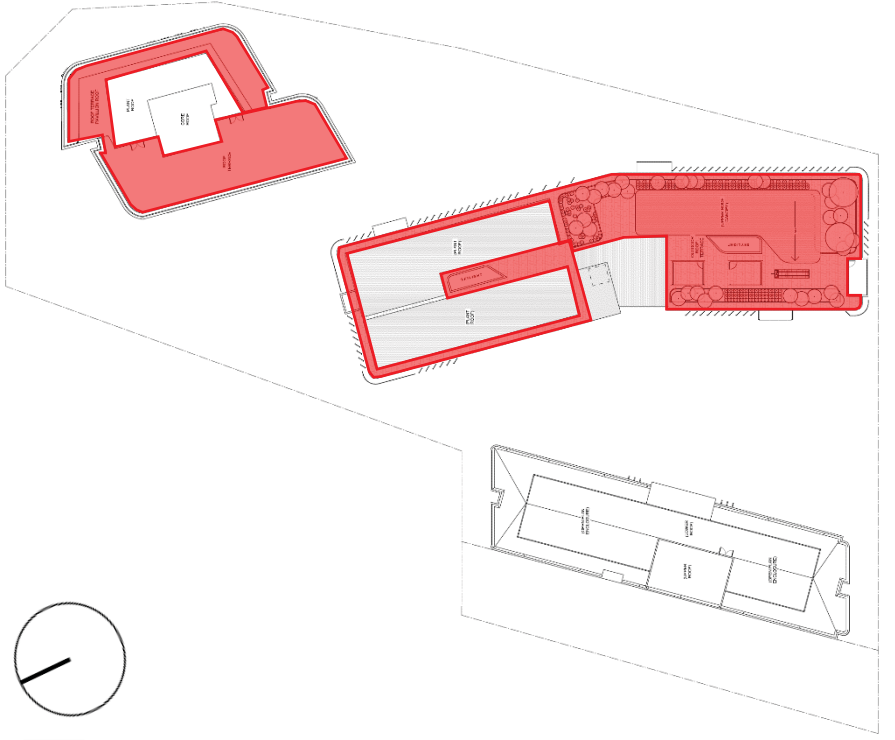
Schematic plan view of proposed development with recommended wind criteria overlaid on level 2 of the proposed developments
